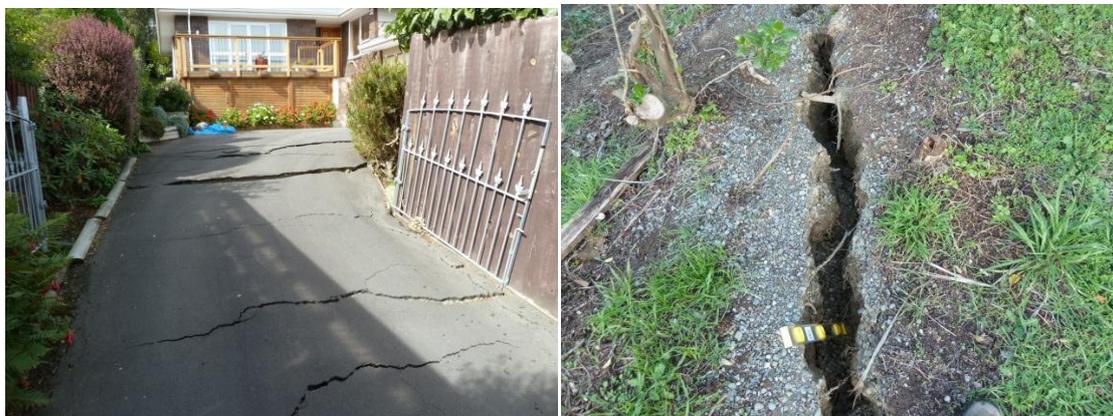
(left): Tension cracking across a driveway on Vernon Terrace
